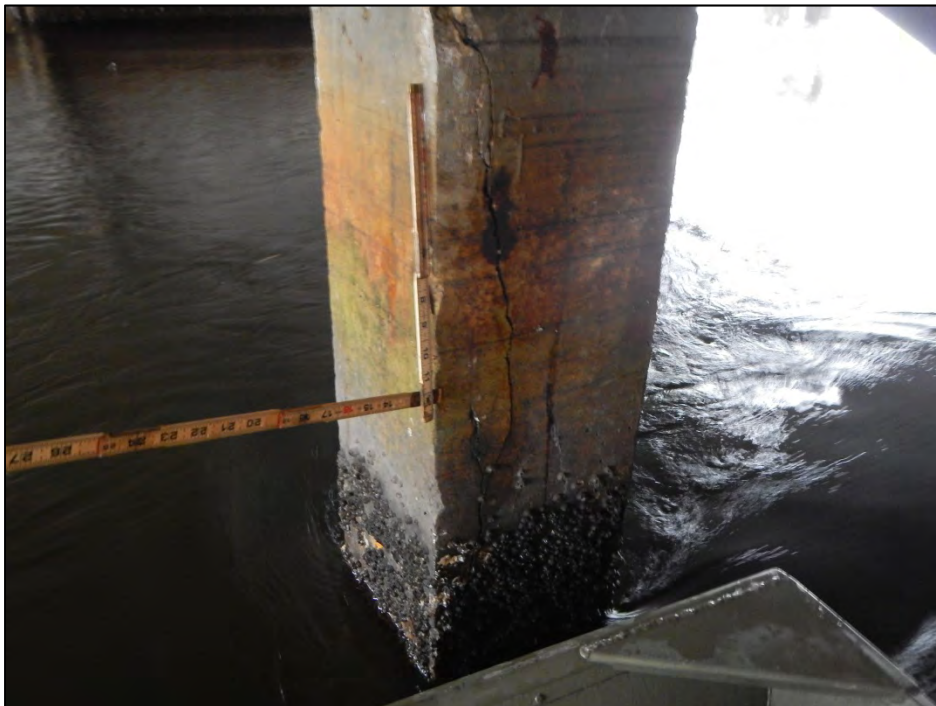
The southwest and northwest corners of Pile 2-2 exhibit vertical cracks.
